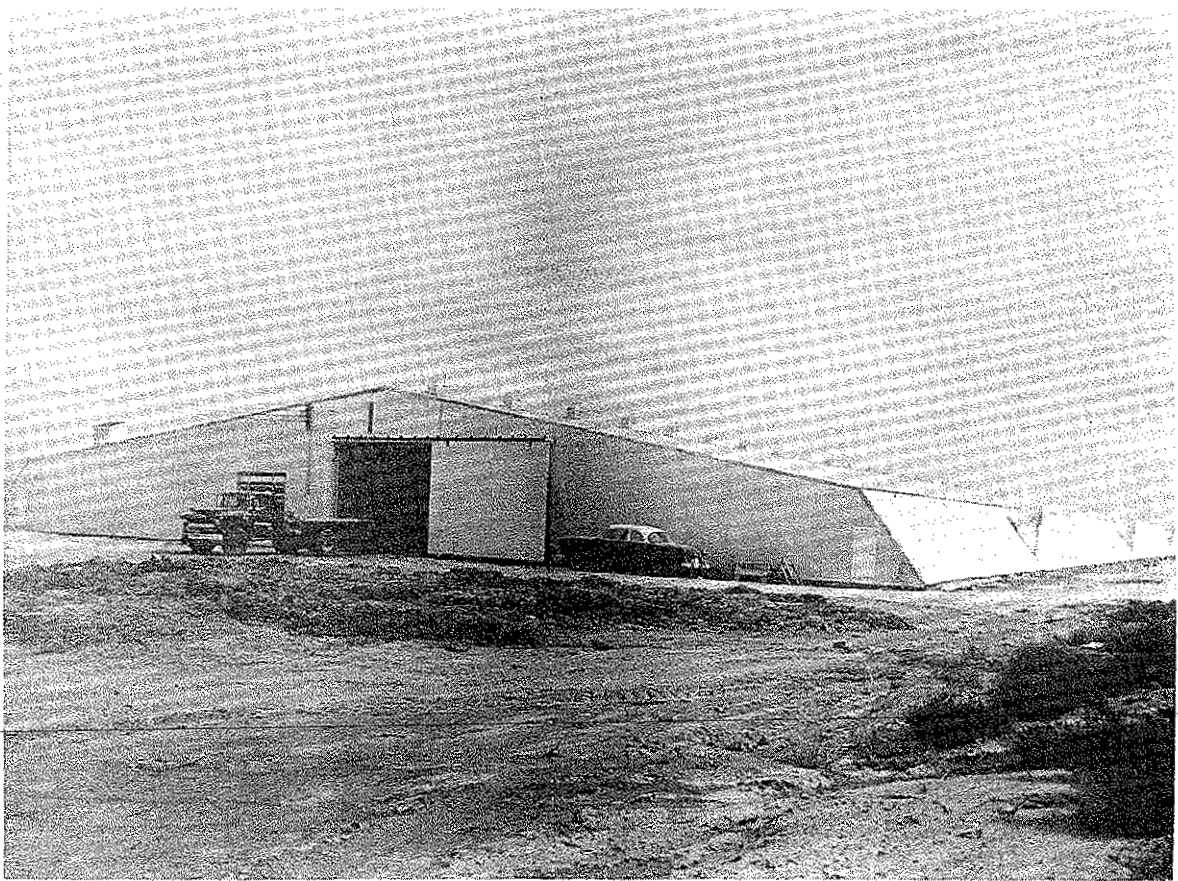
Steel covered pole-frame structure. Photo courtesy of U. P. Railroad.
